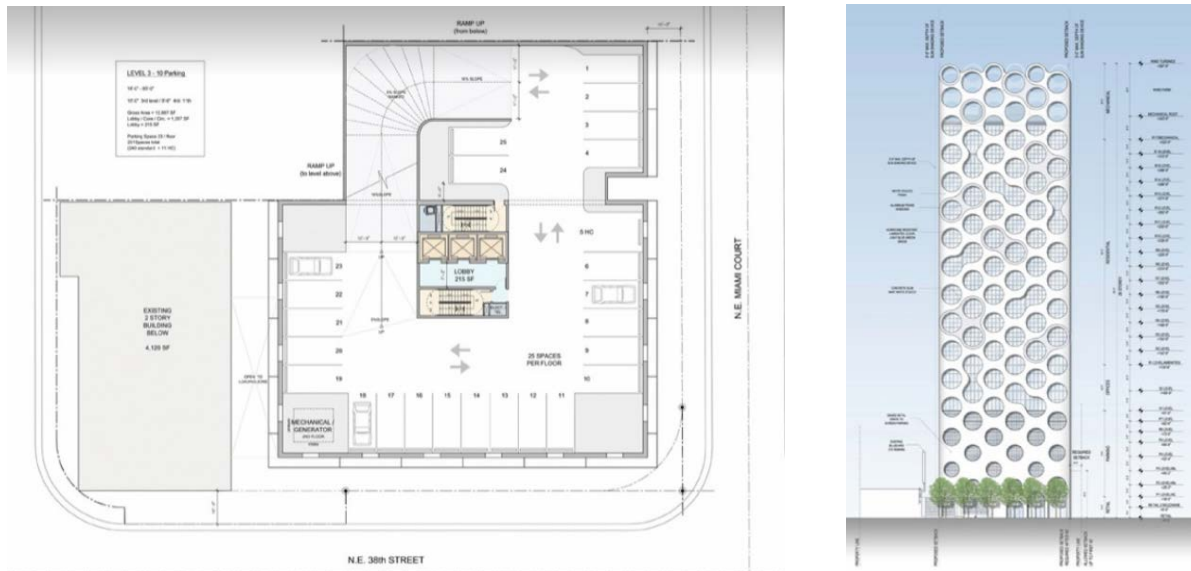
COR Building, the parking level and the elevation view of perforated shell
